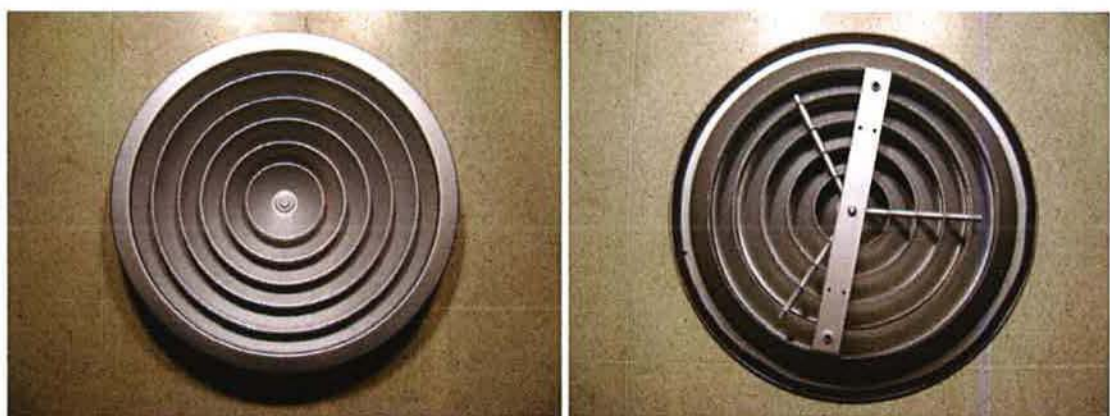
Round Ceiling Diffuser (Neck: Ø295mm)
